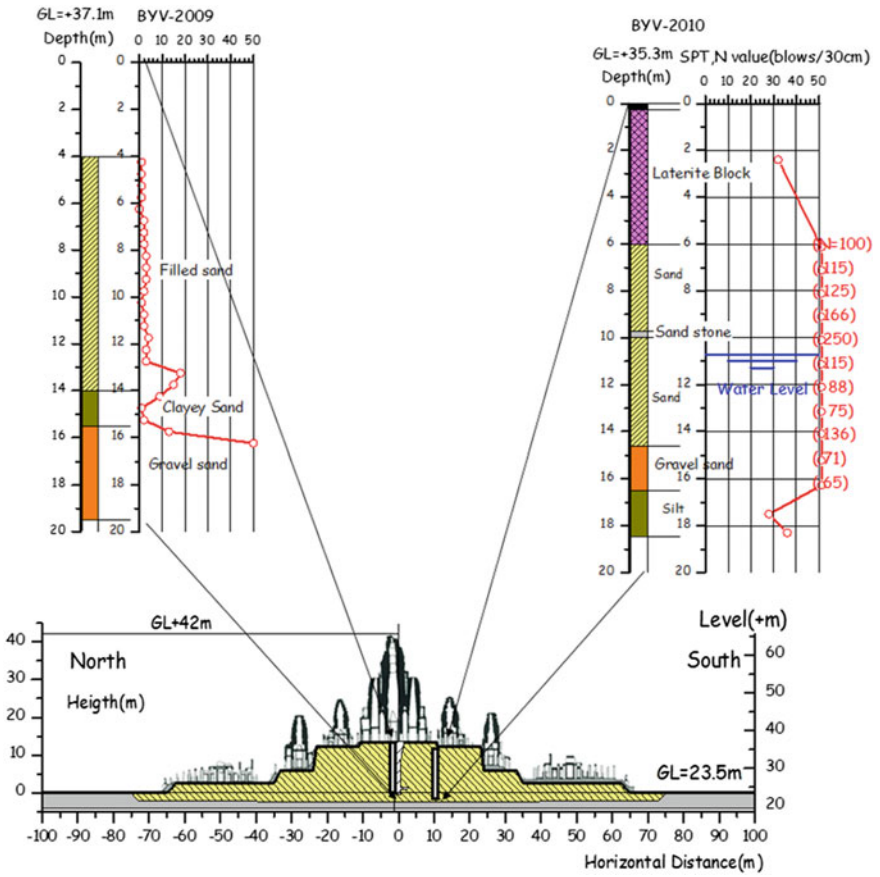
Boring results at the platform foundation of central tower of Bayon
